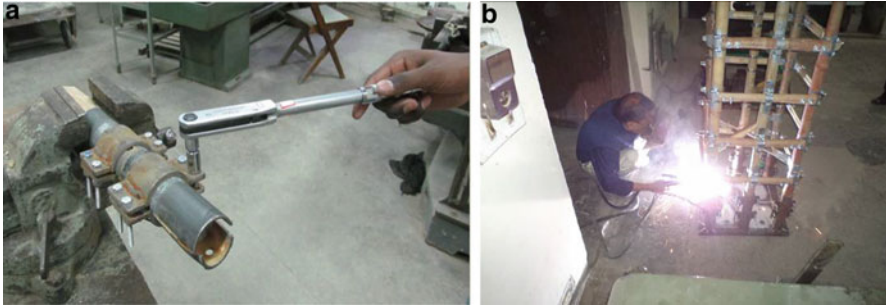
(a) Typical fixture for bamboo. (b) Welding of column to base plate
